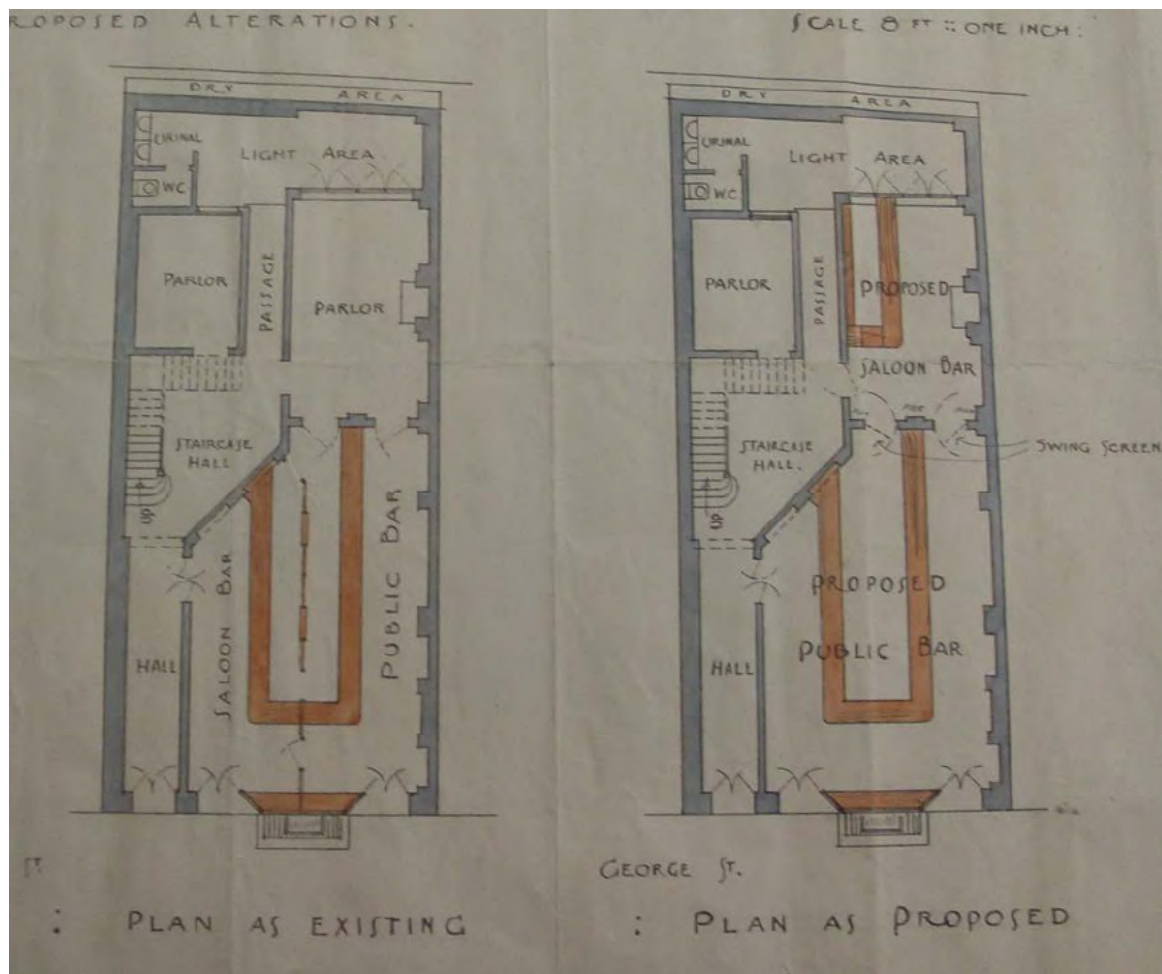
Plan of the existing bar in 1916 showing the centrally configured bar with divided public and saloon bars. The proposal, designed by W.H Foggitt, architect for the Housing Board, included construction of a saloon bar at the rear which opened up the front section of the bar.
